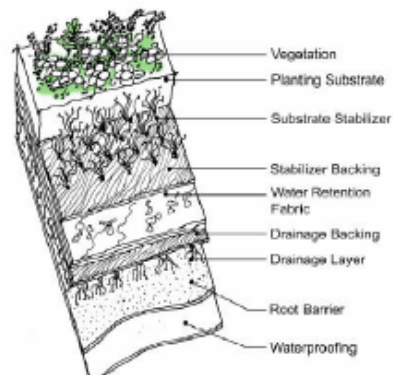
Xero Flor System installation and cross section. (Adapted from Xero Flor Canada).
